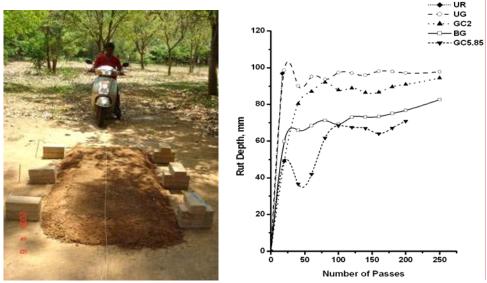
Test on unpaved road section Figure 24: Role of reinforcement in reducing rut depth
